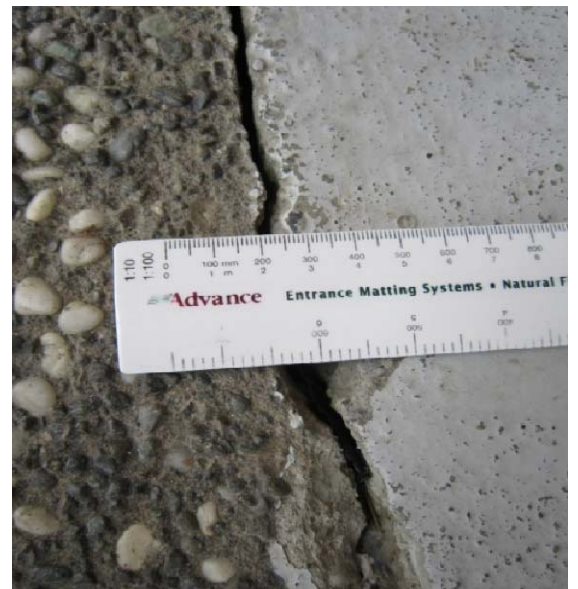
Separation of internal floor and adjacent footpath of approximately 3mm in places with spalled area of concrete
